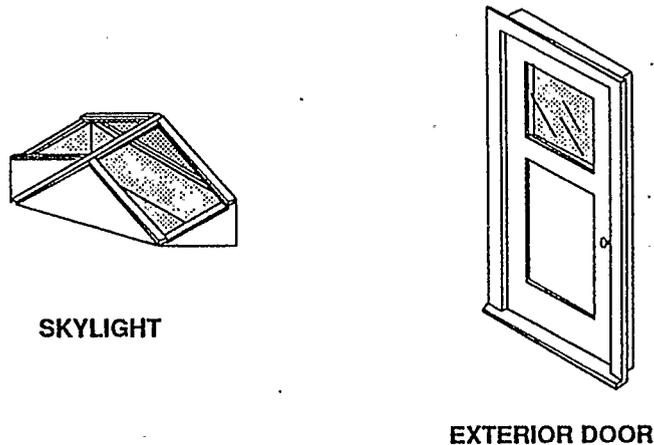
Isometrics of skylight assembly and standard exterior door
